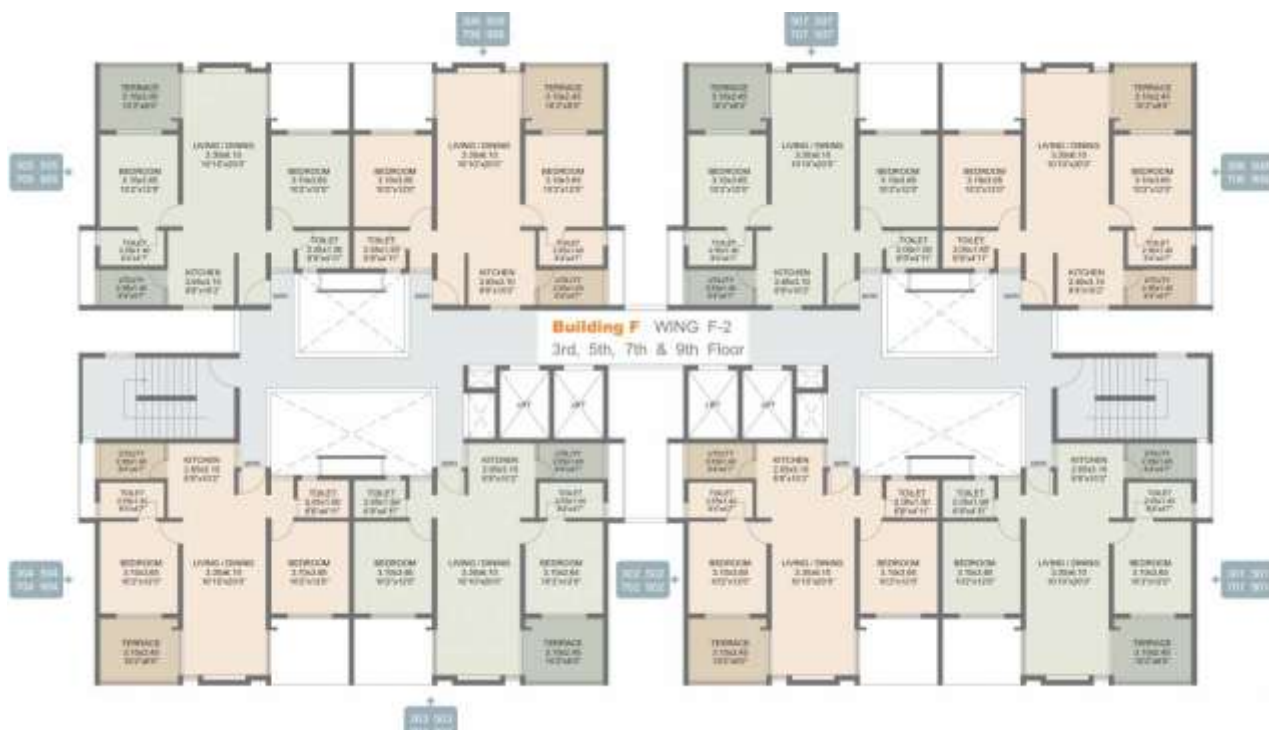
Layout plan of F2 Bldg. (FL. No. 3,5,7,9).
